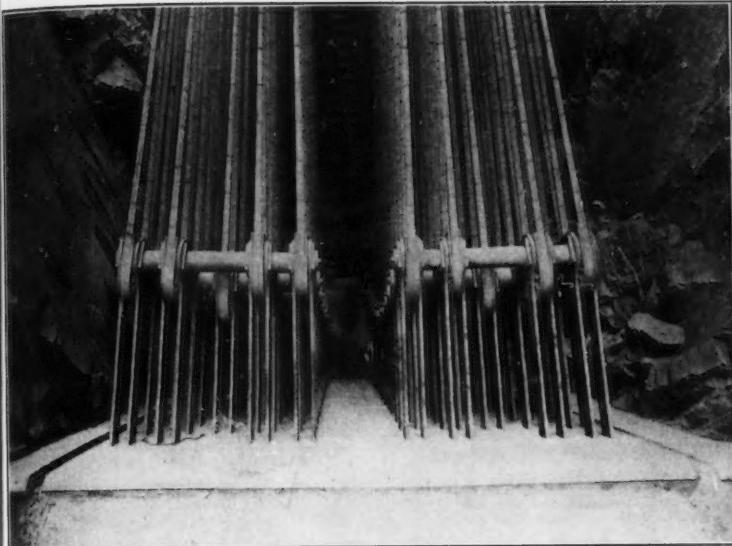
STRAND SHOES IN NEW JERSEY ANCHORAGE.
